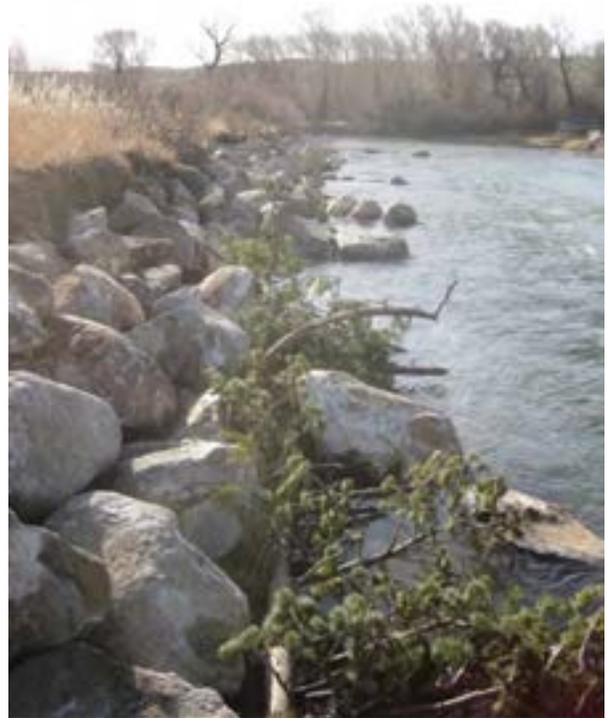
Looking downstream on the Wind River after installation of trees and rock revetments to protect the eroding stream bank.
